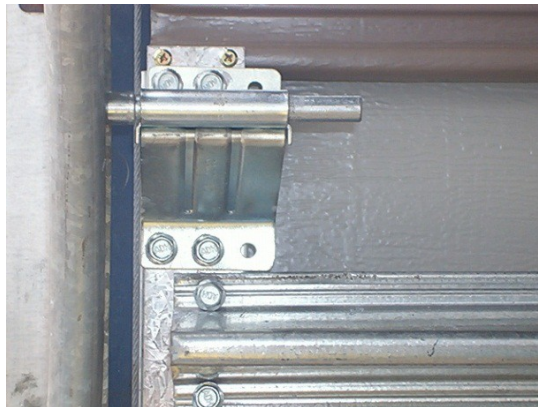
Top Bracket Mounting with Strut (if supplied)
